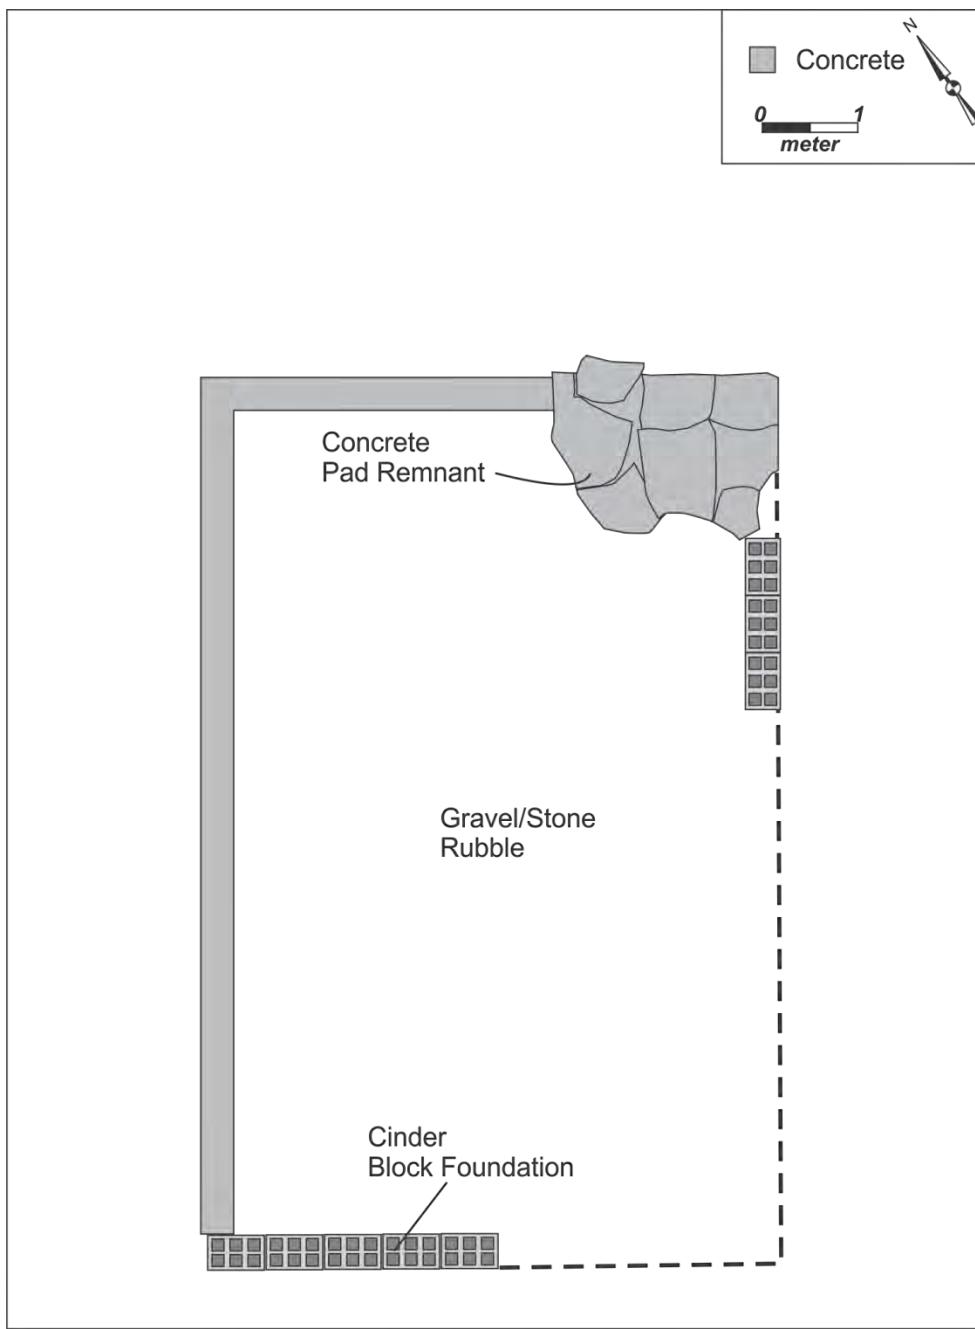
Illustration of a cinder block and poured concrete garage foundation at Stockdale Road Dairy (33Pk217).
